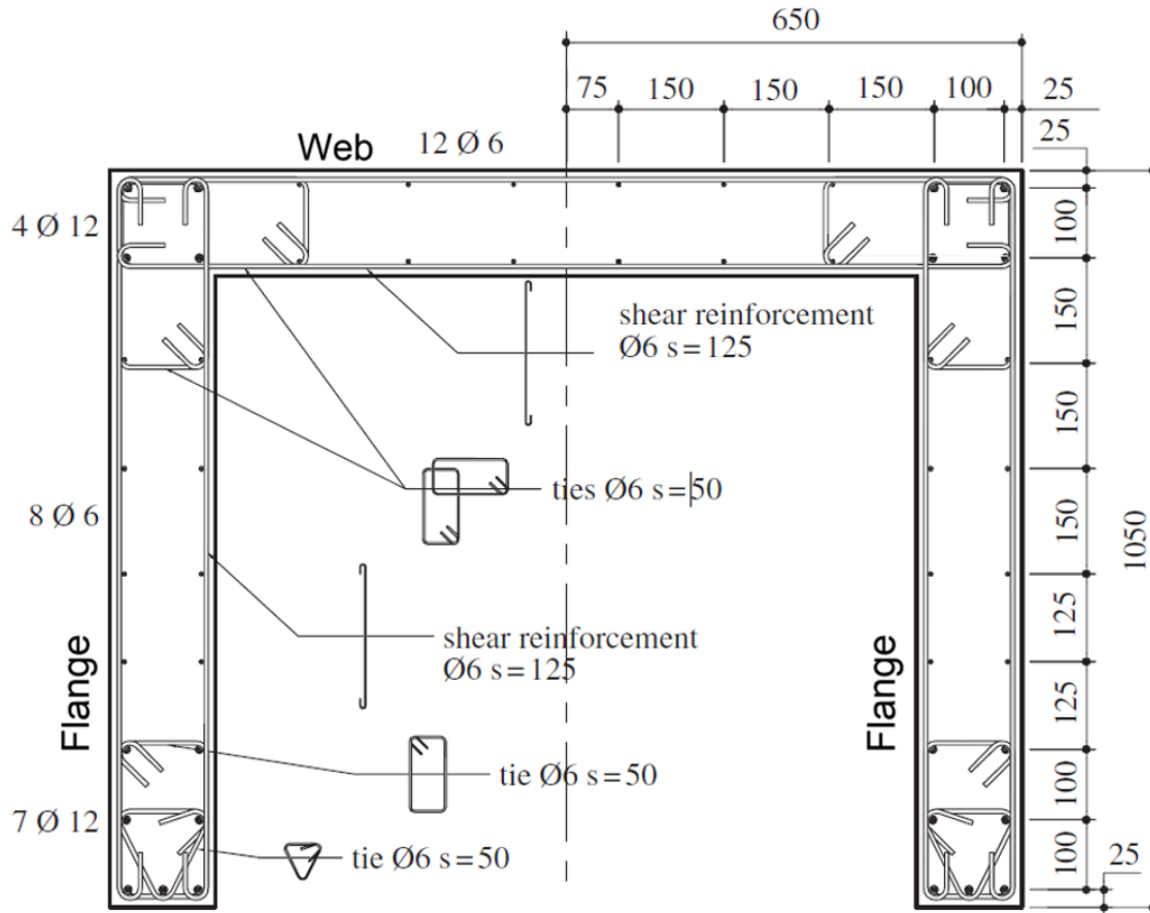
TUA: Cross section and reinforcement detailing from [3] [Unit: mm].
